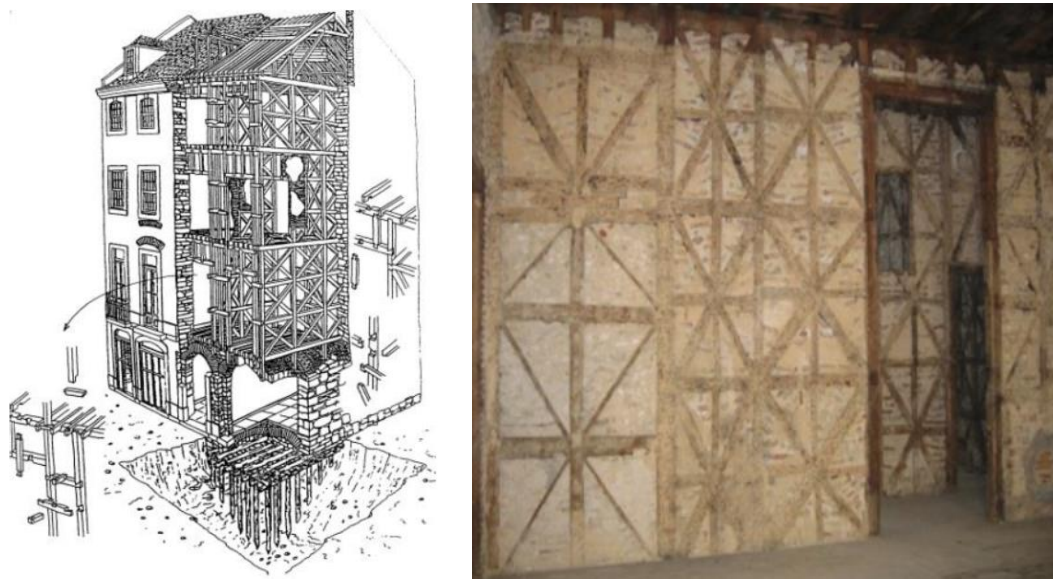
Pombalino building. (a) Structure of a whole building. (b) Example of a frontal wall. (Poletti, 2013)
